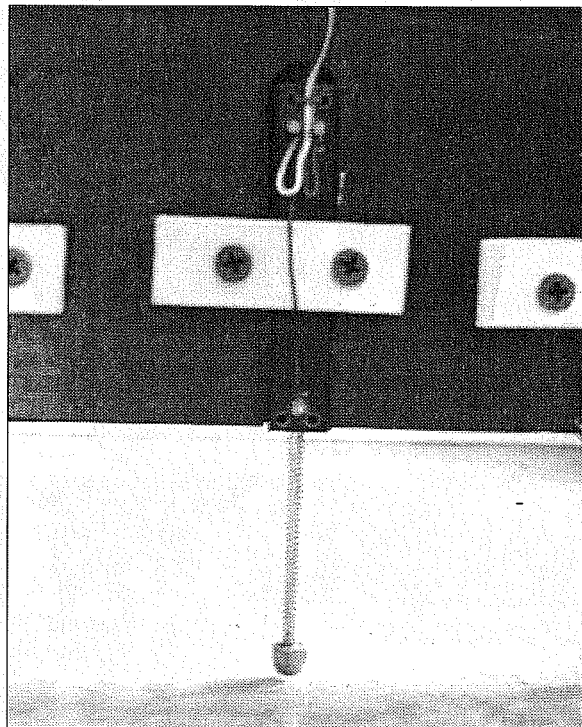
Placement of Strain Gages on Longitudinal Stiffeners
